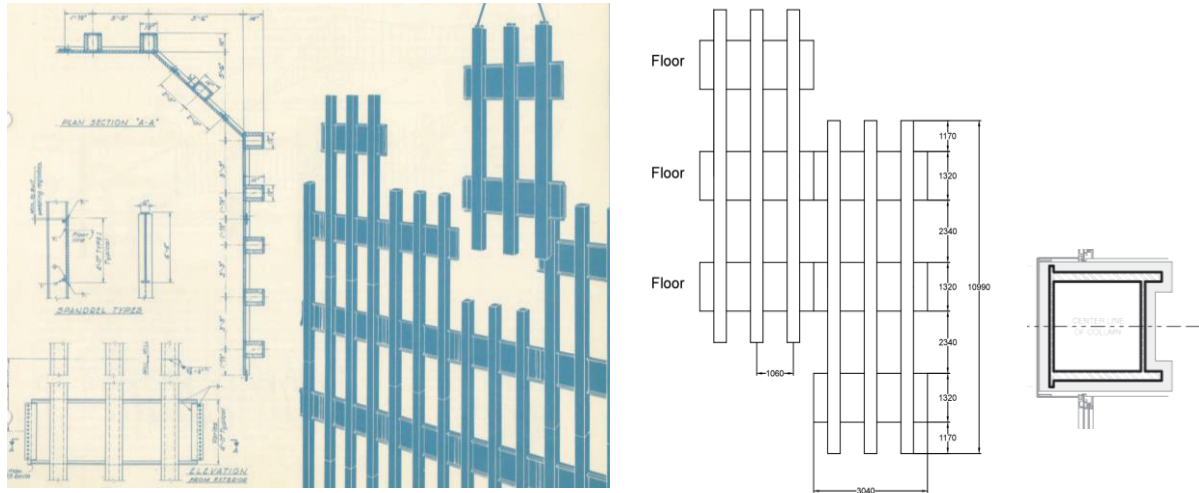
Schematic of contemporary steel design – perimeter columns with cross section (unit: mm)
